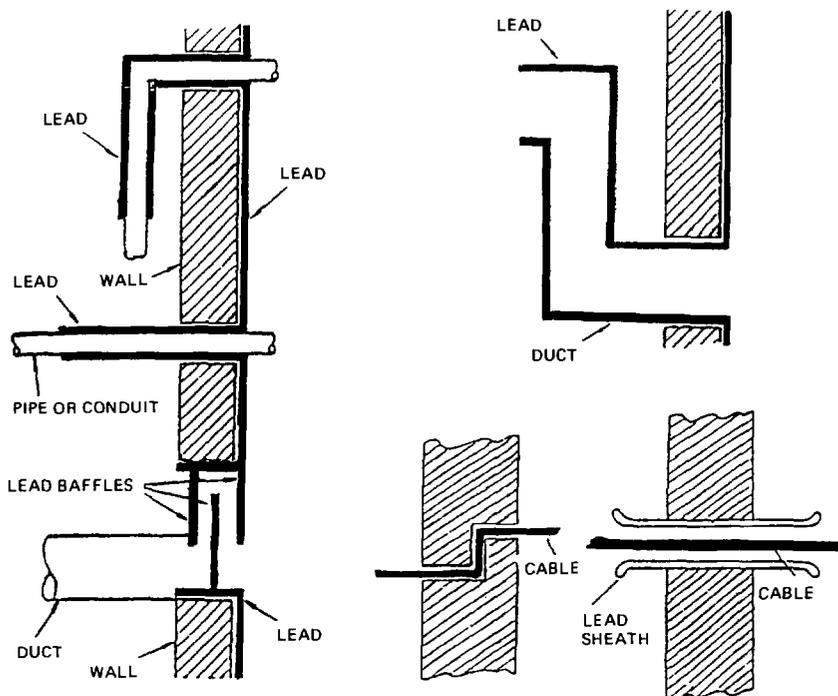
Methods of shielding when pipes, ducts, conduits or cables must pass through walls of exposure room.
